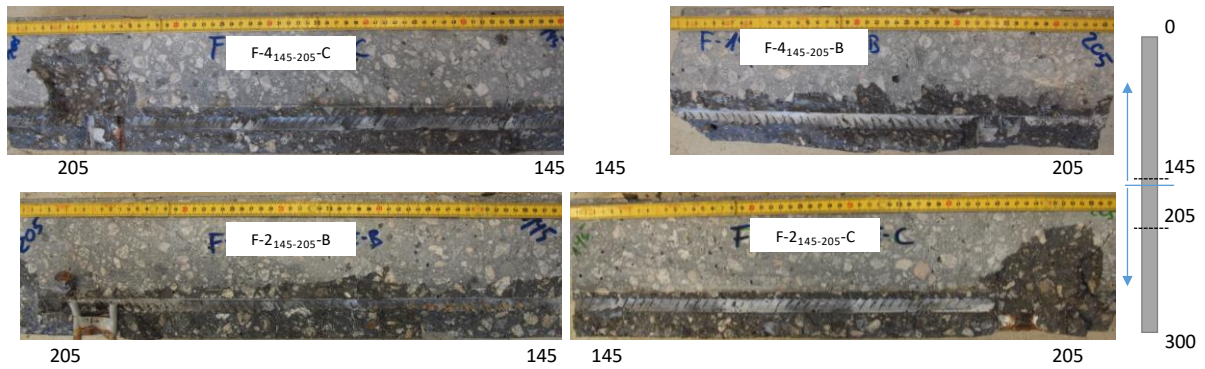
Steel-concrete interface of beam F section 145 to 205 cm. White precipitate at the cracks and spread over the steel-concrete interface. Localized corrosion at the spacer
